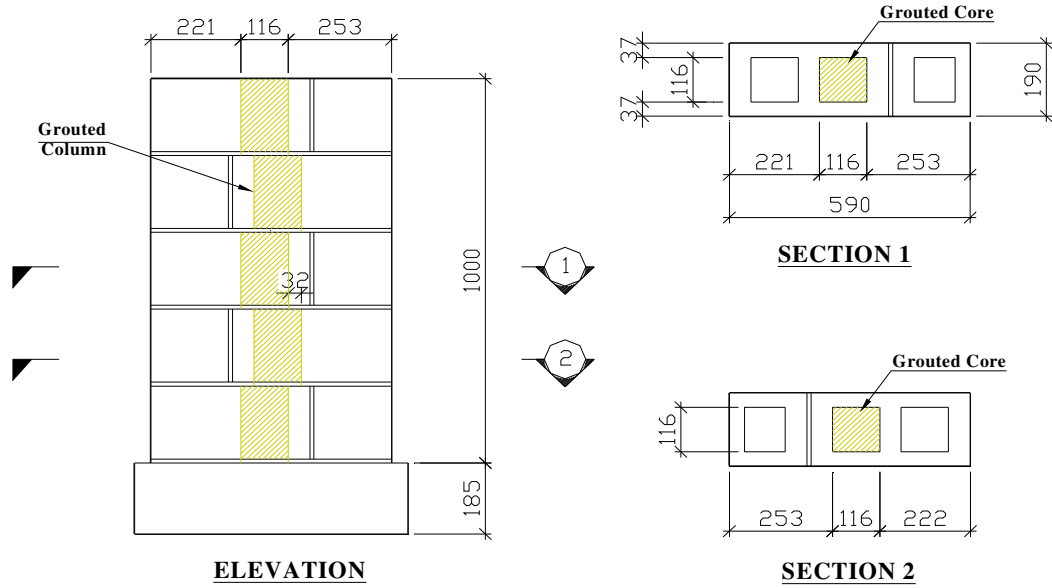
Type A wall test specimens (dimensions in mm).
